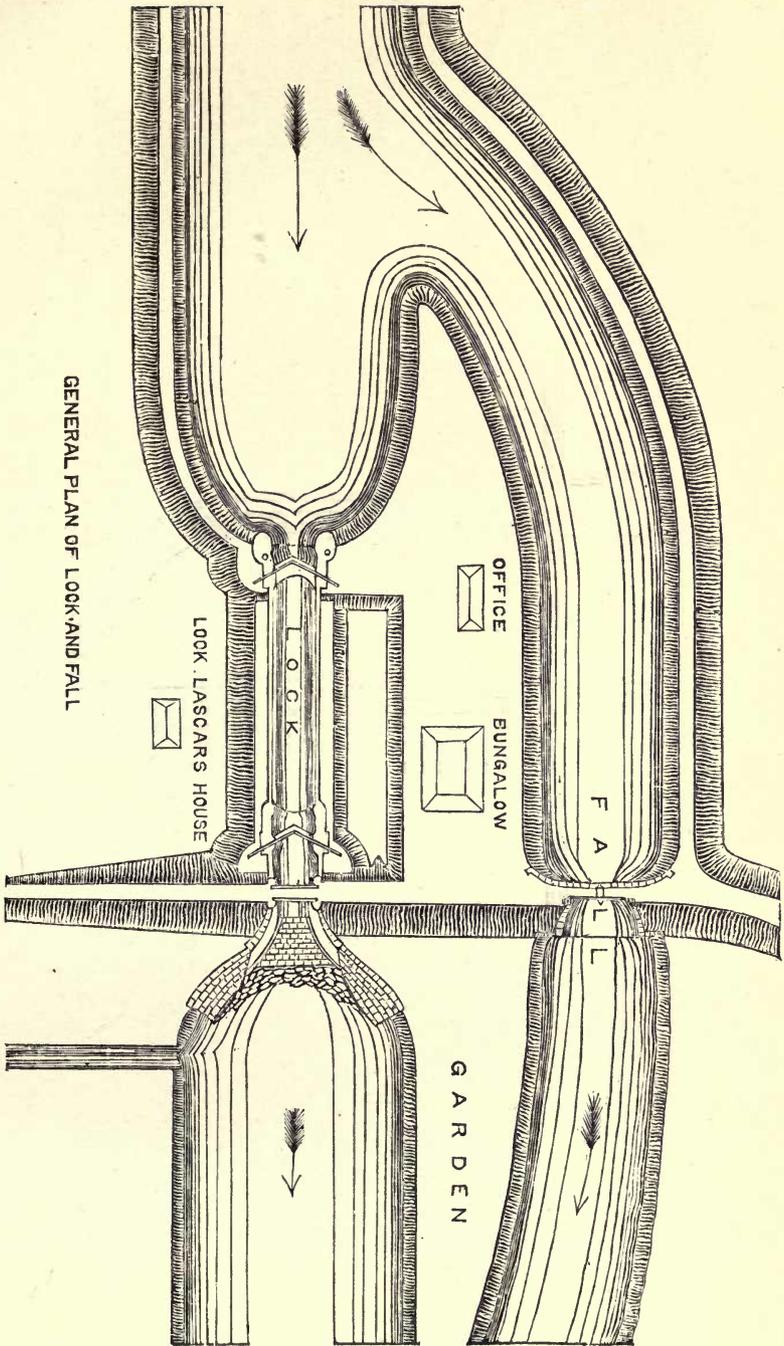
General Site Plan of Lock on Midnapore Canal,
